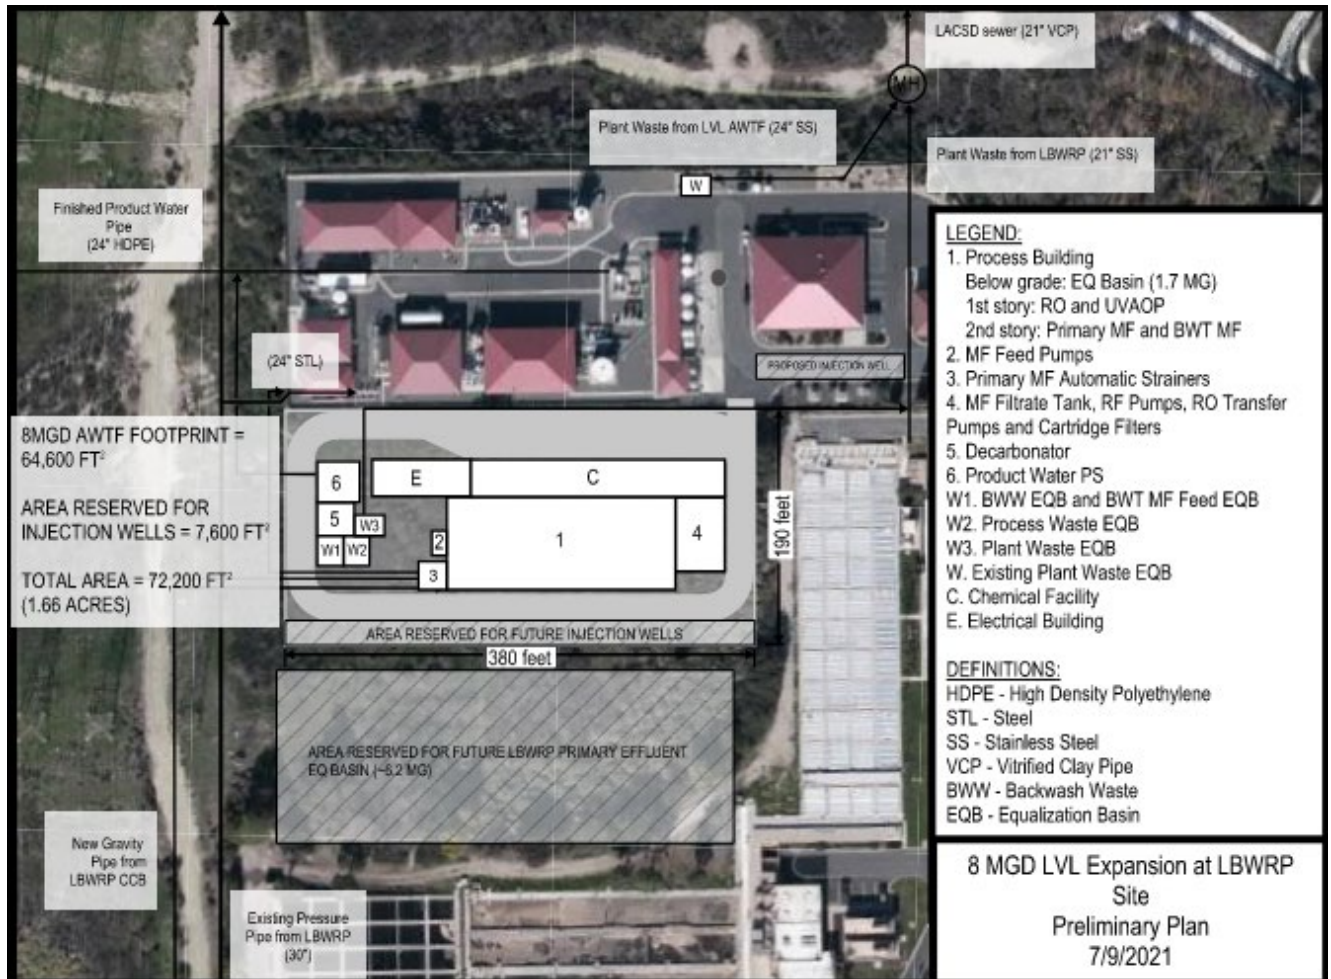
Expansion Advanced Water Treatment Plant Layout at the Long Beach Water Reclamation Plant Site
